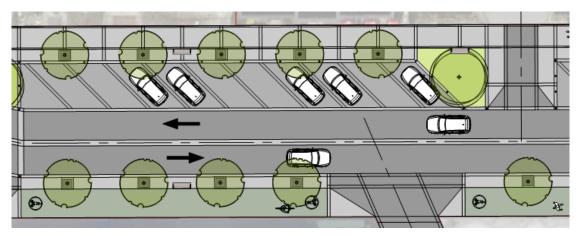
Typical layout of Two-way Travel Lane, MUP on South Side and Angled Parking on North Side
